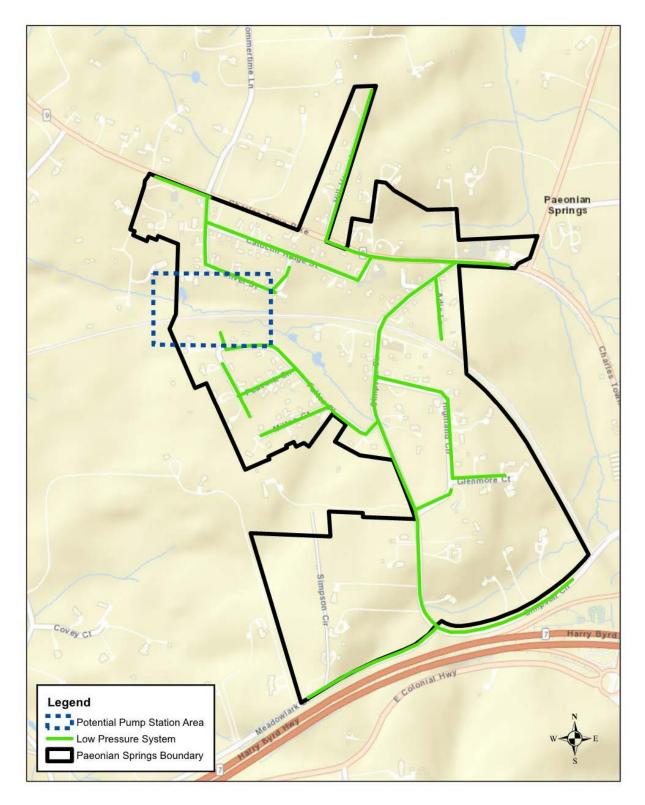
ALTERNATIVE 2 SEWER LAYOUT
